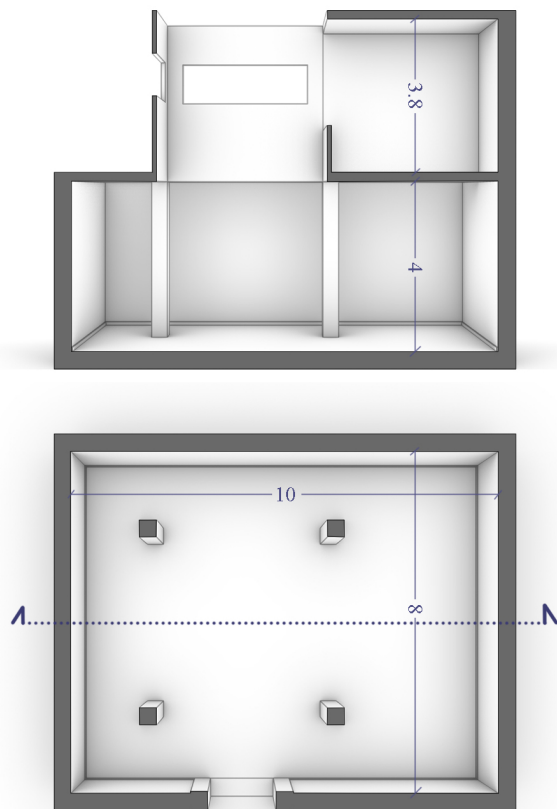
Perspective section and floor plan of AnGA's architecture. All measurements are in metres (Authors' elaboration).
